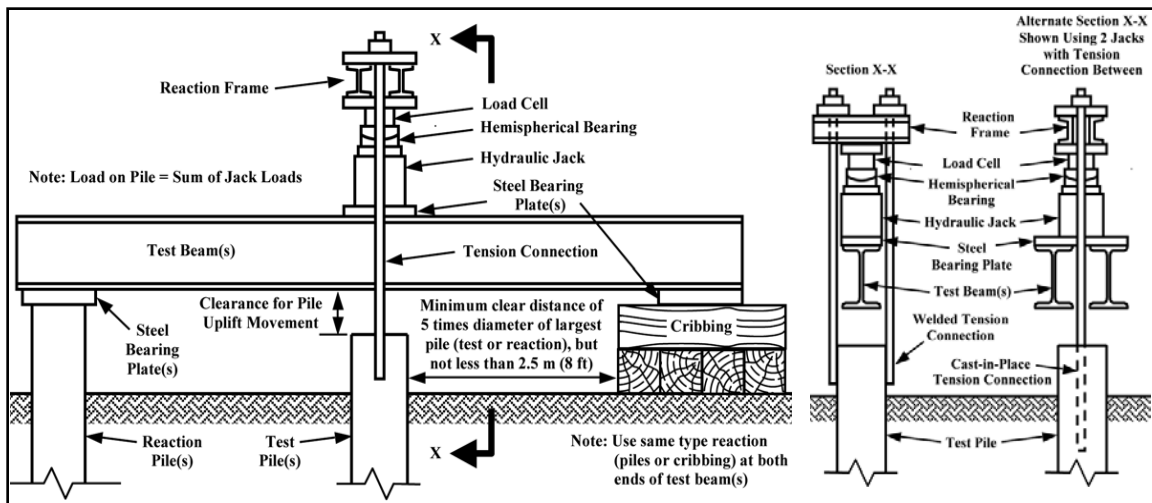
Typical setup for tensile load test using hydraulic jack(s) supported on test beams (ASTM D3689 – 07).
